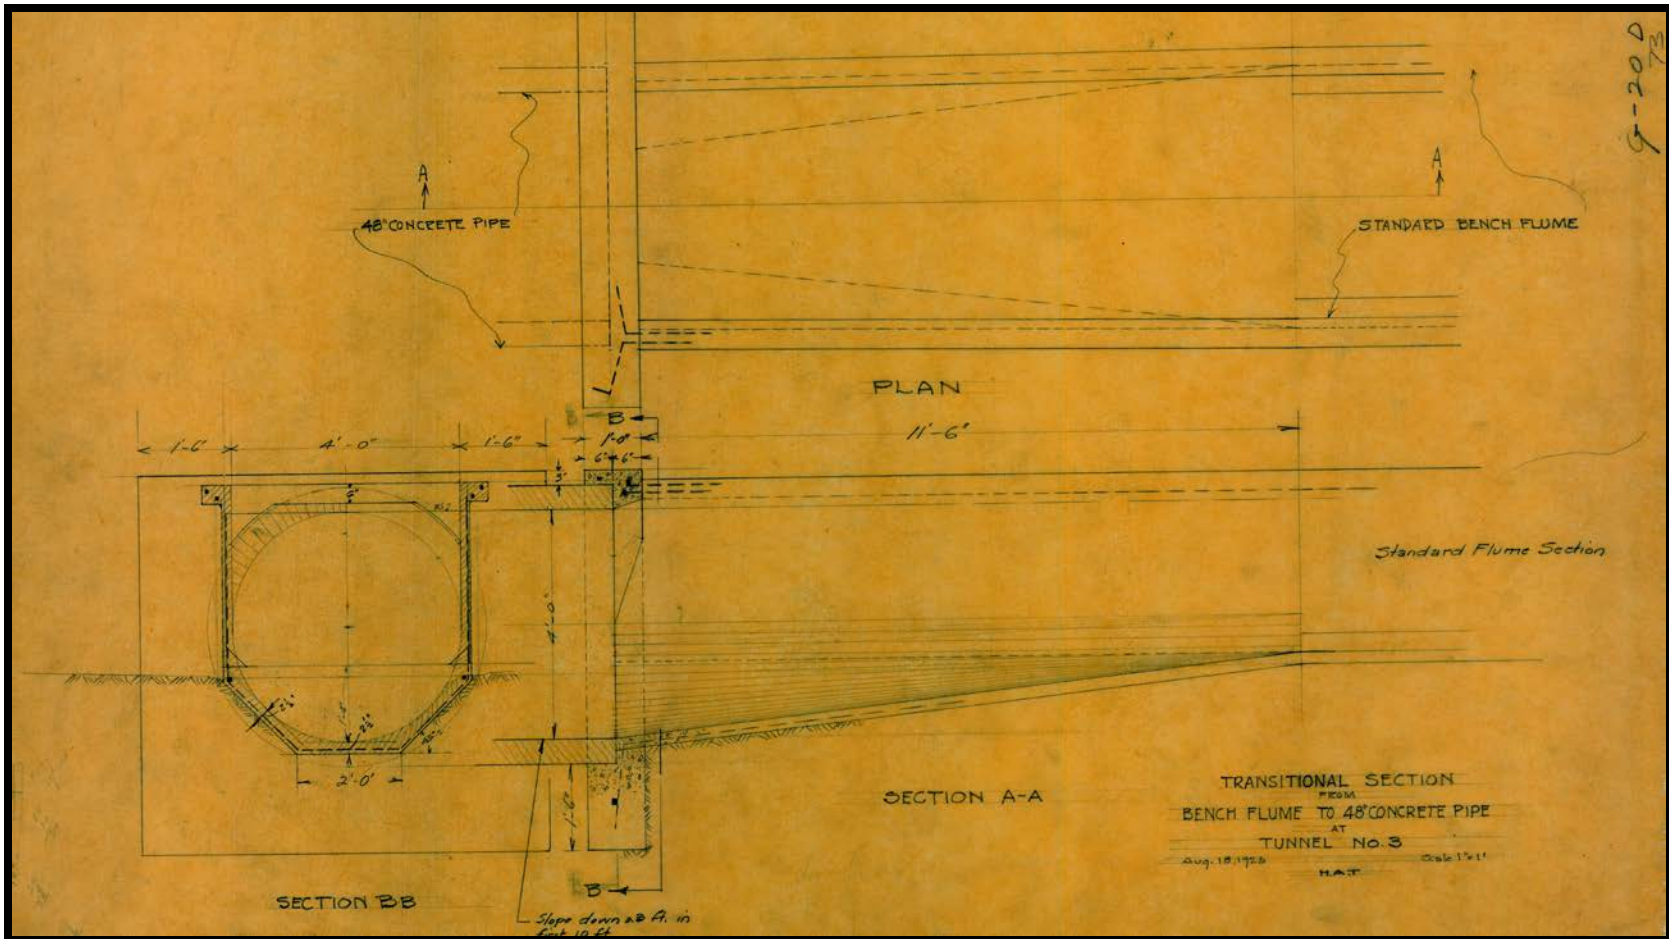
Drawing of the transition from bench flume to the concrete pipe of Little Tunnel (Tunnel # 3).
